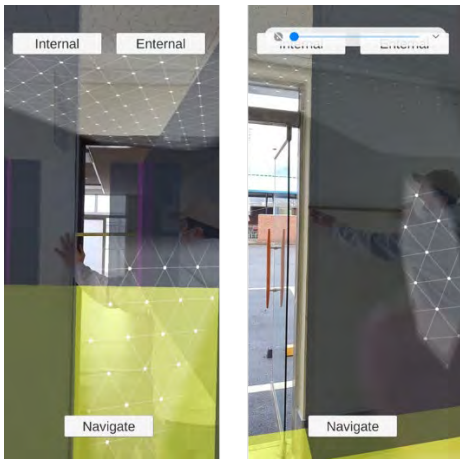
The model alignment test results: Wall 1 (left) and Wall 2 (right)
